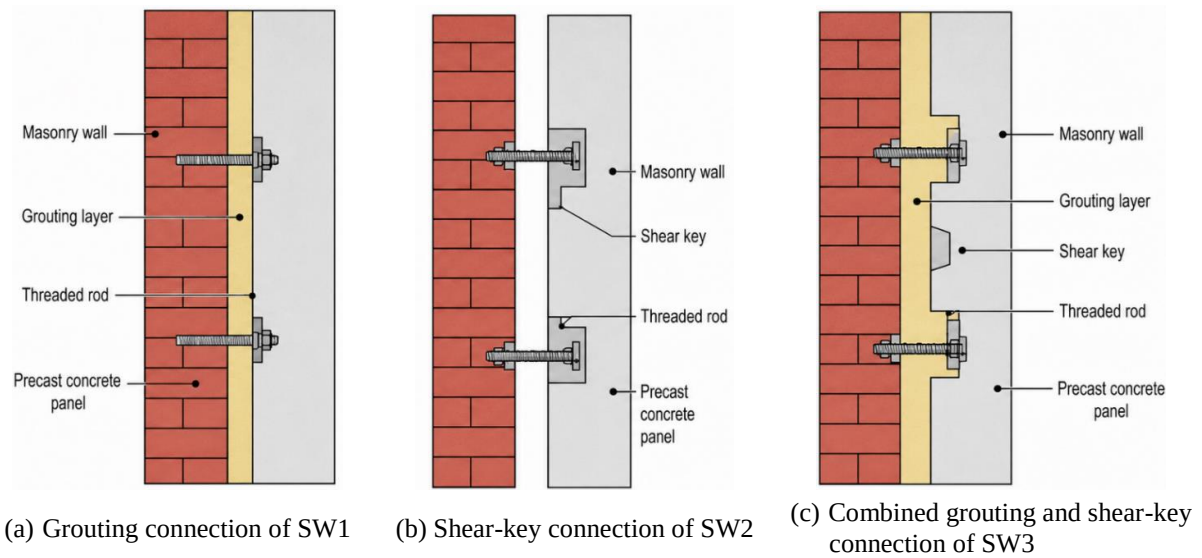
Enlarged sectional views of the panel-to-wall connections
